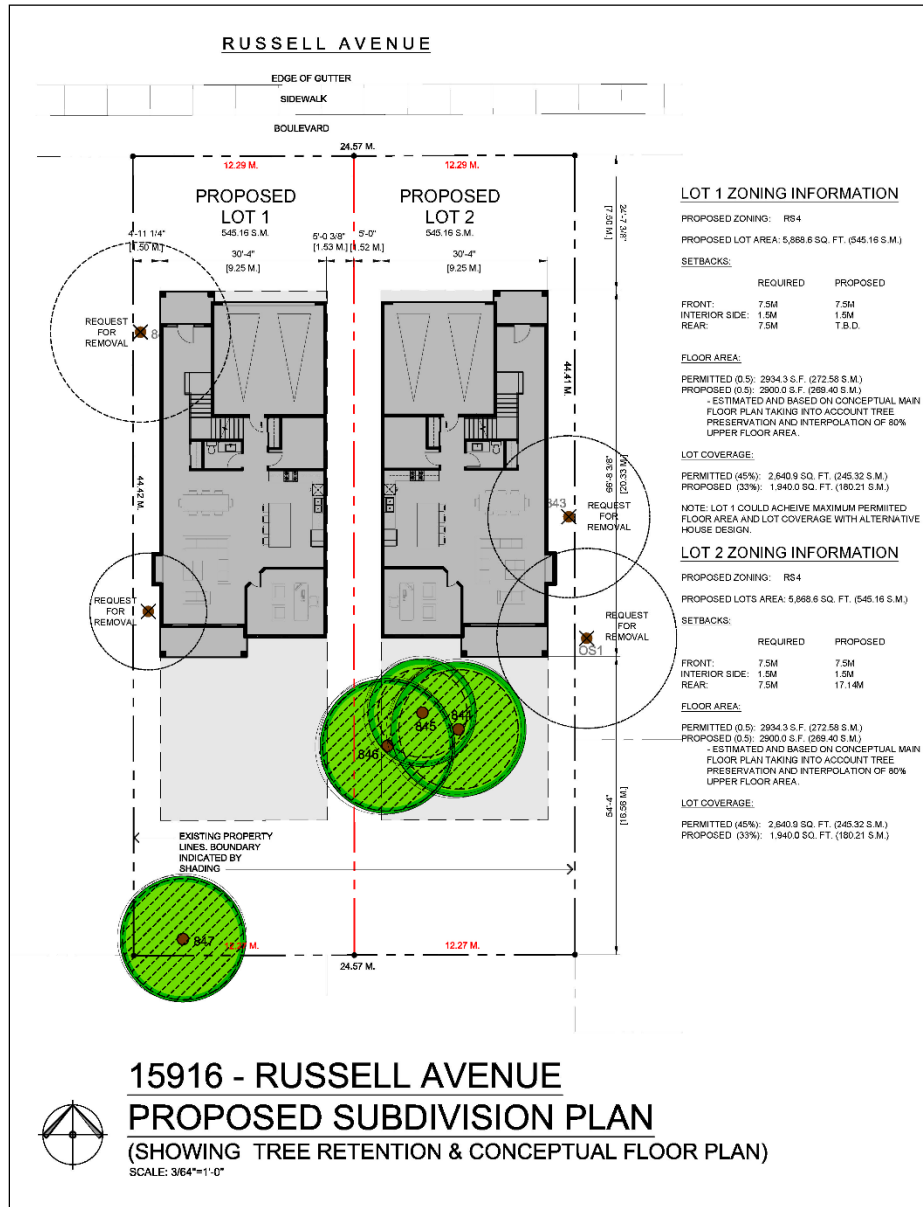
Proposed Subdivision Plan (15916 Russell Avenue)
